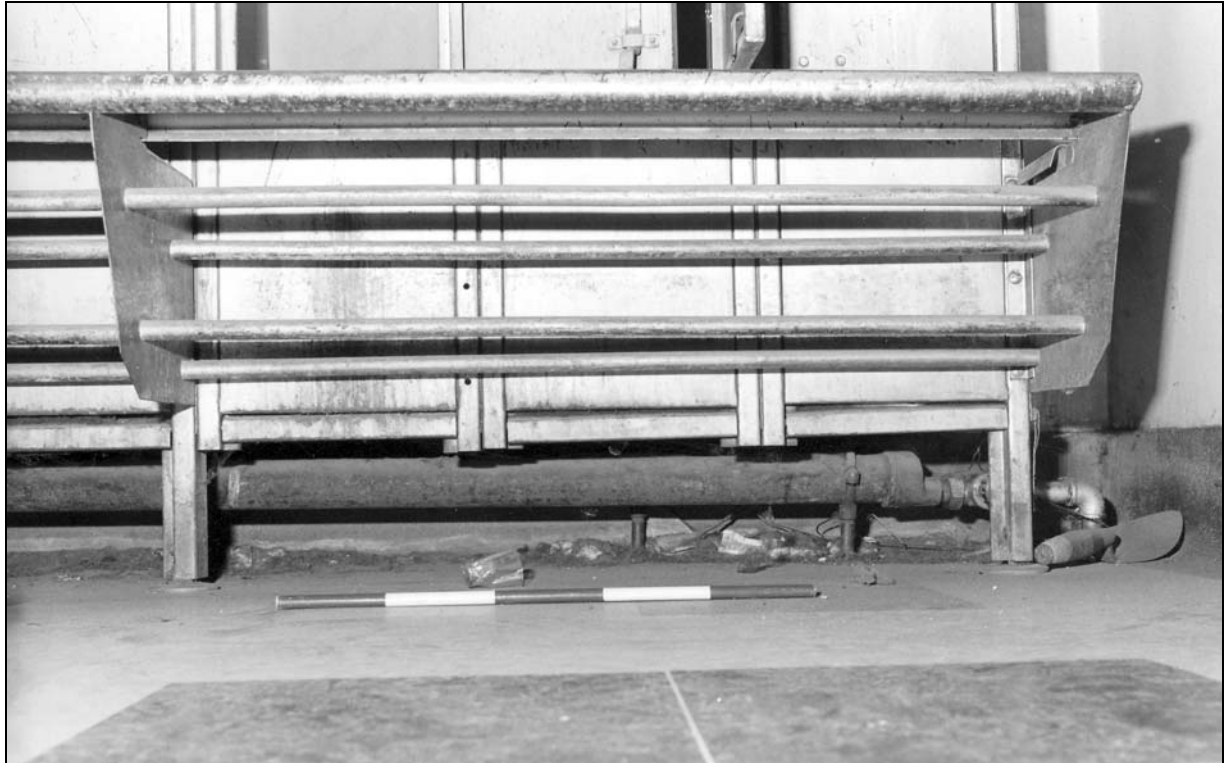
Detail of shoe rack and heating pipes below lockers in “staff toilet” (film 4, frame 2)
